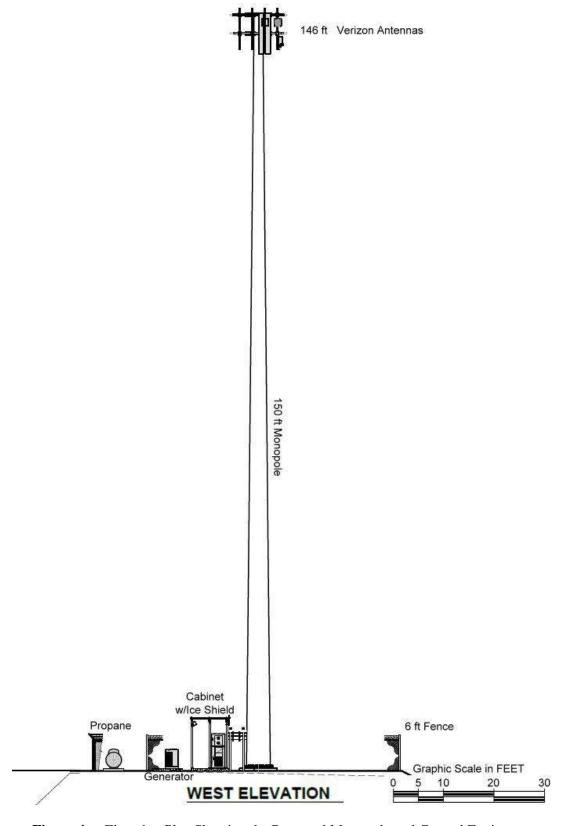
Elevation Plan Showing the Proposed Monopole and Ground Equipment
